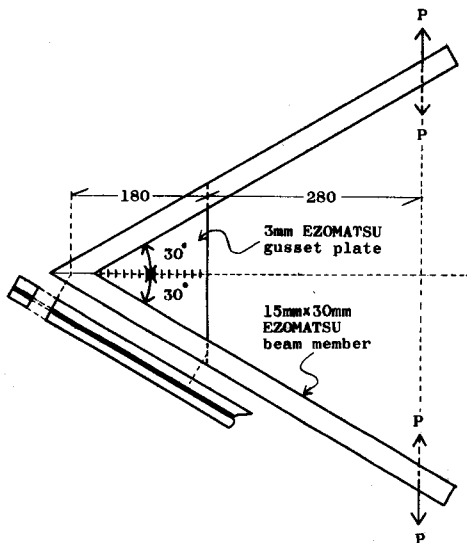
Test specimen of triangular wood gusset. (unit: cm)
